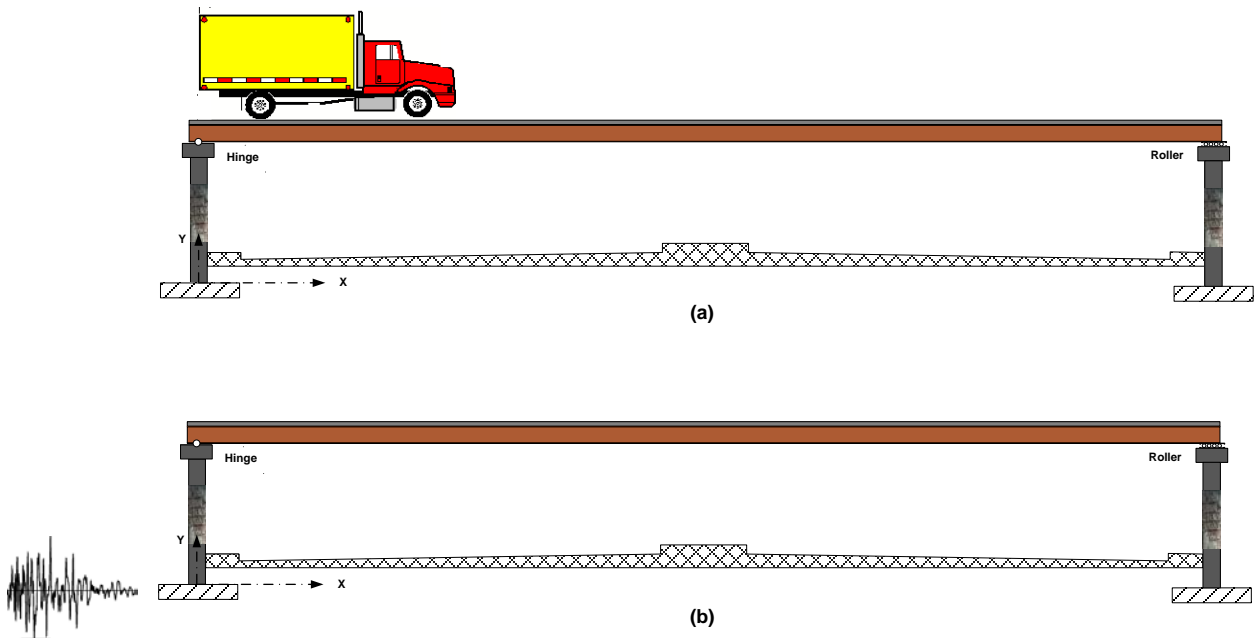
Slab-on-girder bridge under (a) traffic; and (b) seismic loads.
